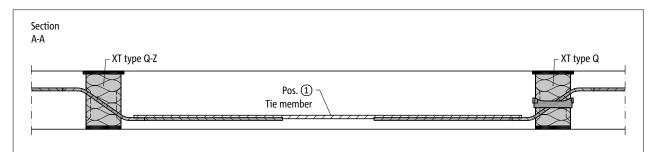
Schöck Isokorb® XT type Q-Z-V5 to Q-Z-V8, Q-V5 to Q-V8: Section A-A; one direction spanned reinforced concrete slab
